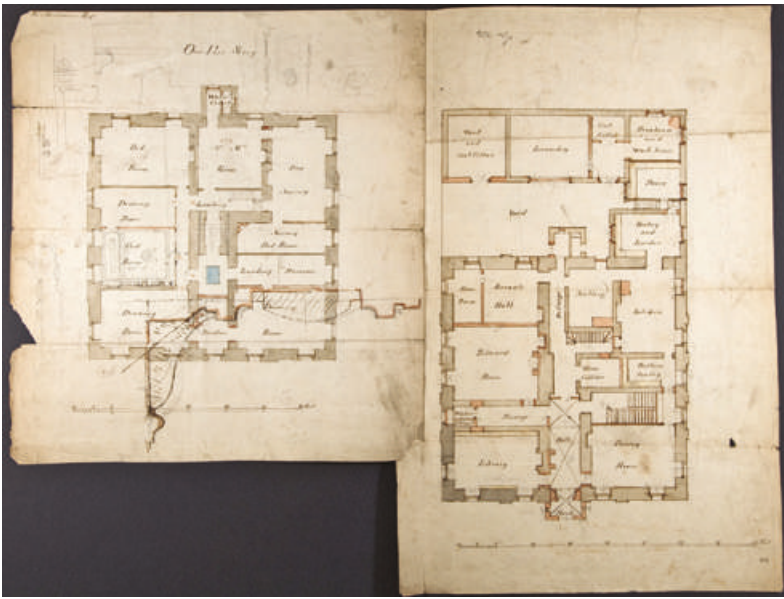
Plans of the ground and first floors of the Pavilion.
